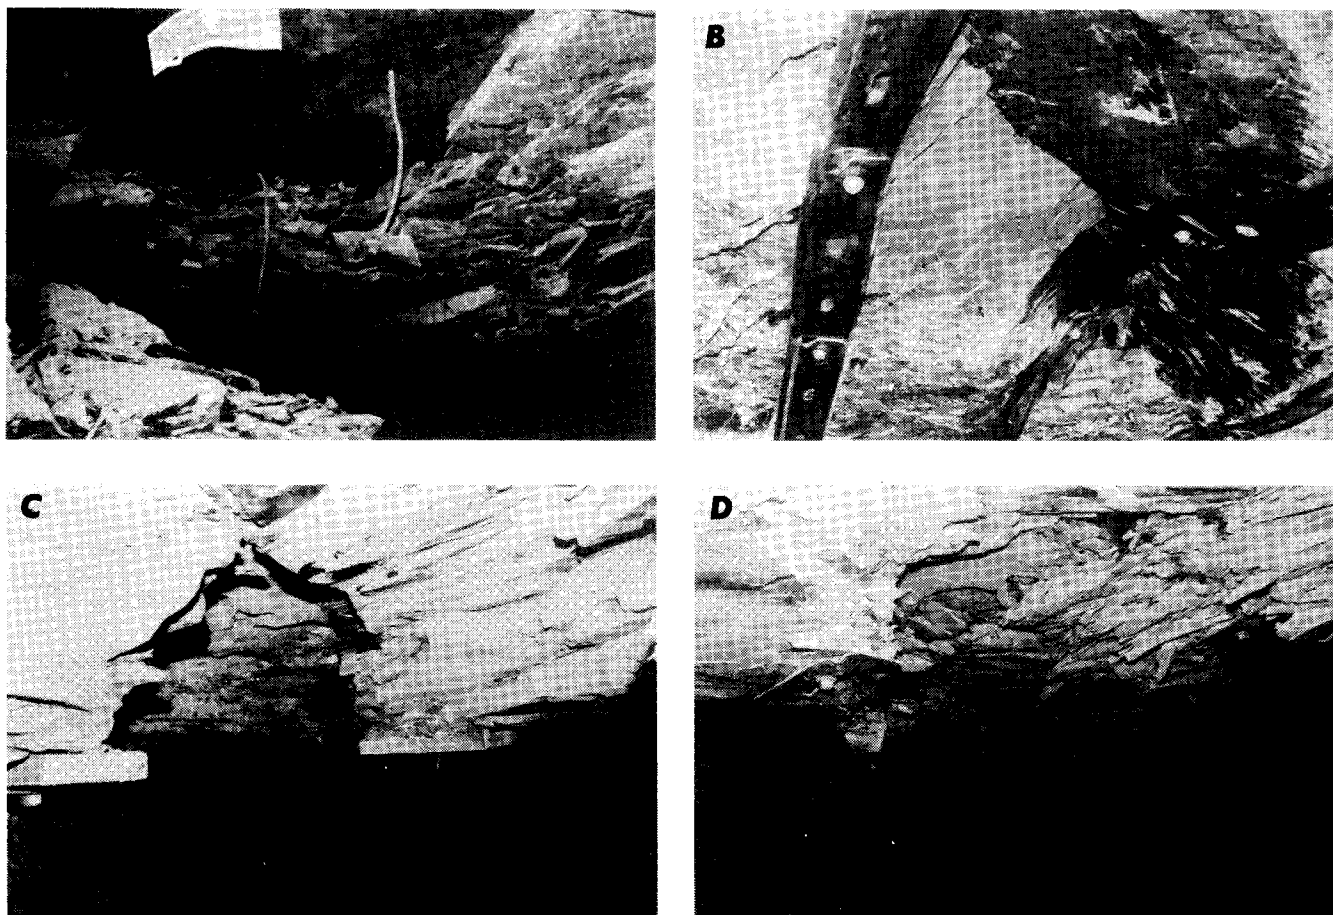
Visual evidence of roof failure. A, Fully exposed bolts; B, roof spalling near strapping; C, roof spalling near bolt; D, roof spalling around bolt.
